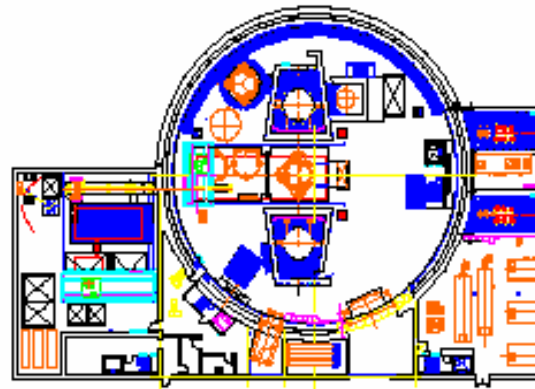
AP1000 Plan showing semi-circular In-Containment Refueling Water Storage Tank (IRWST)
